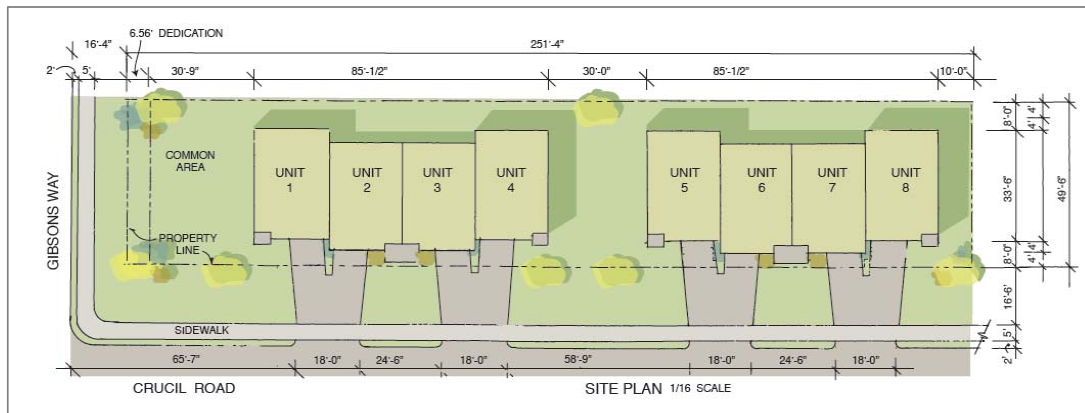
Site plan for previously approved townhouse development at 665 Crucil Road
